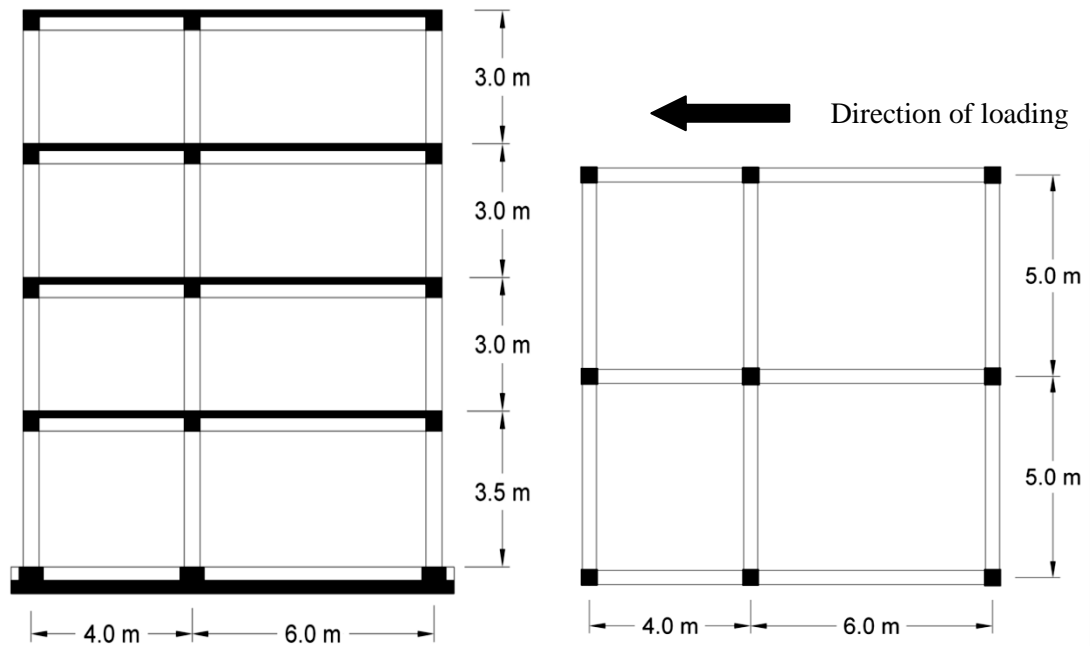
The four-storey reinforced concrete frame building (Dolsek, 2008)
